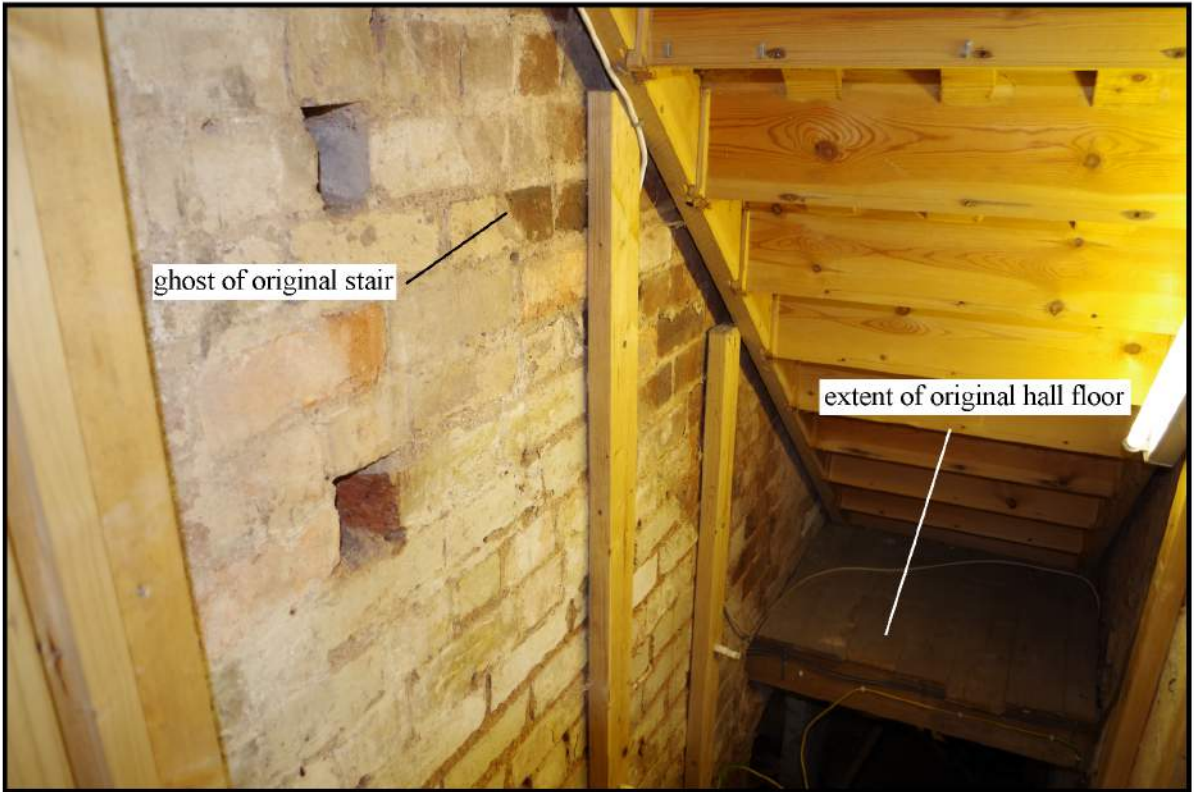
Ground floor, room 2; showing former position of stair and extent of room 6 floor
